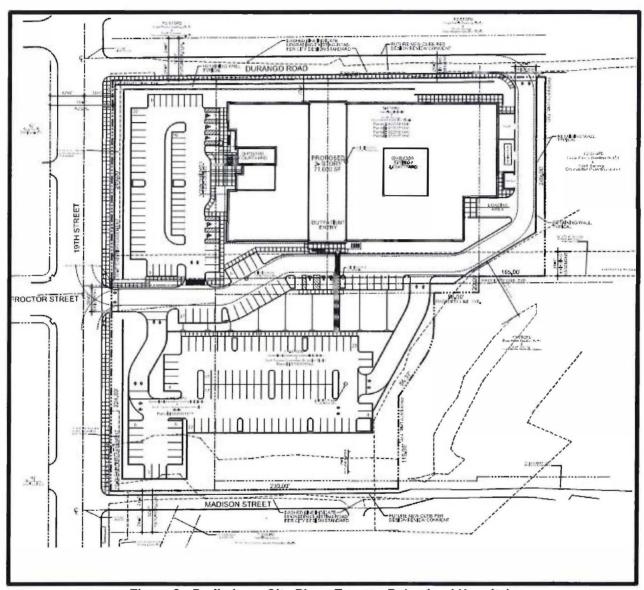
Preliminary Site Plan - Tacoma Behavioral Hospital
